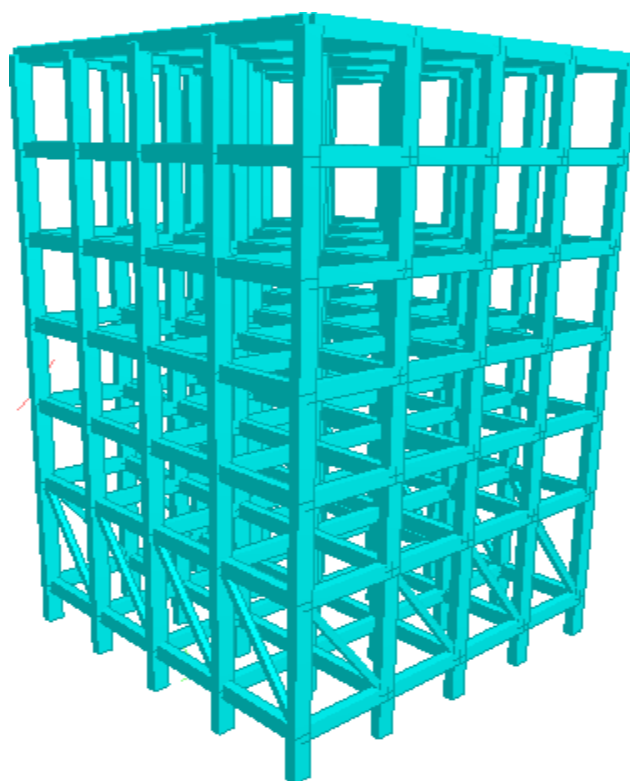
10 3D View Of Ground Floor Soft Storey With Inclined Column Render View
